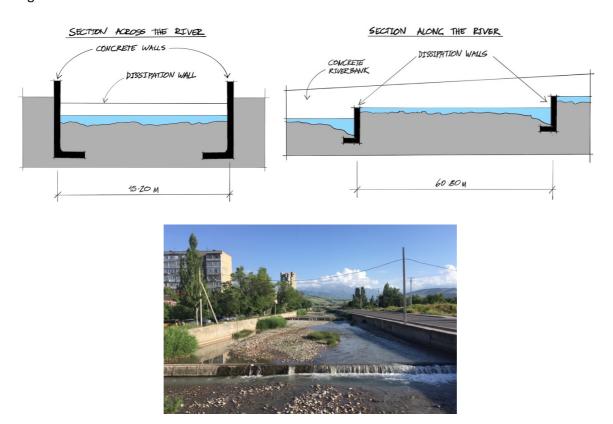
Concrete banks and dissipation walls along the rivers (drawings and photo by the authors)
